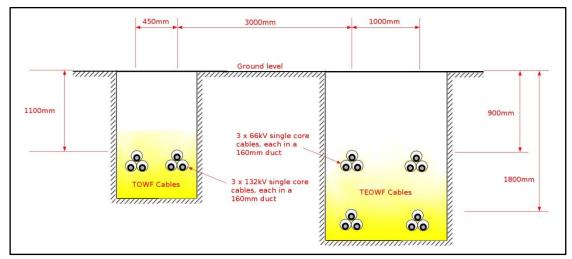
General arrangement of TOWF and TEOWF in parallel in Sandwich Road
